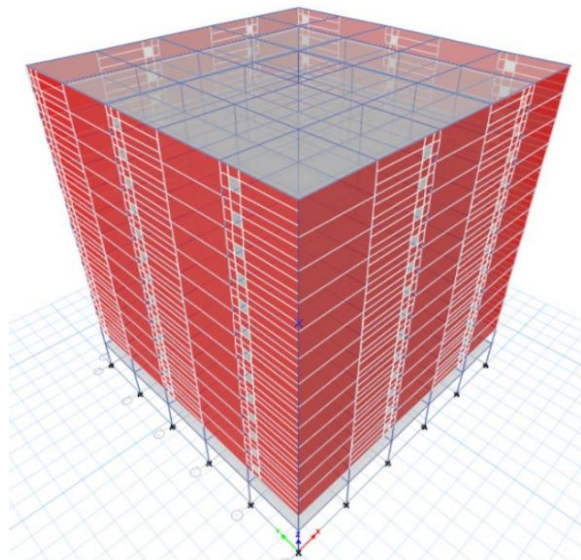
3D ETABS Model — Model B (RC Shear Walls with Openings)
